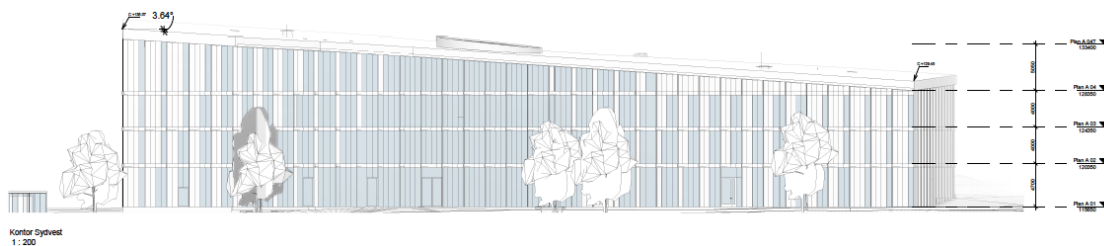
Southwest facade of the new building in wing A of the Ocean Space Center, Image: Snøhetta
